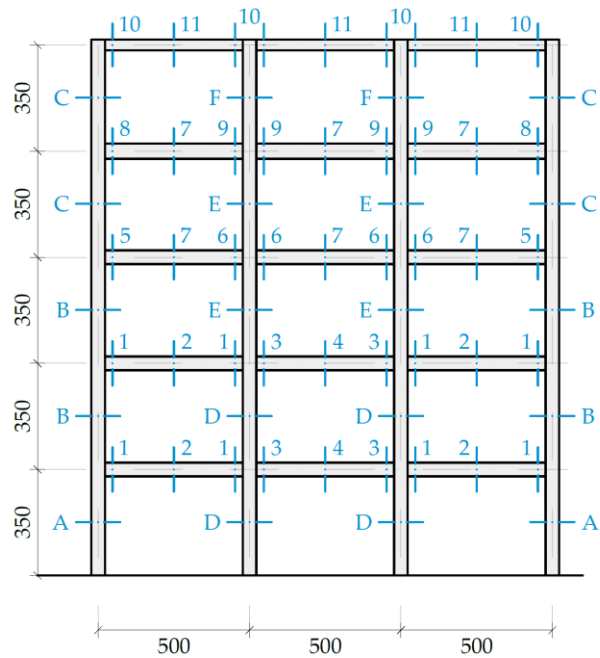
Indication of the main sections of beams and columns of frame "DCM".
